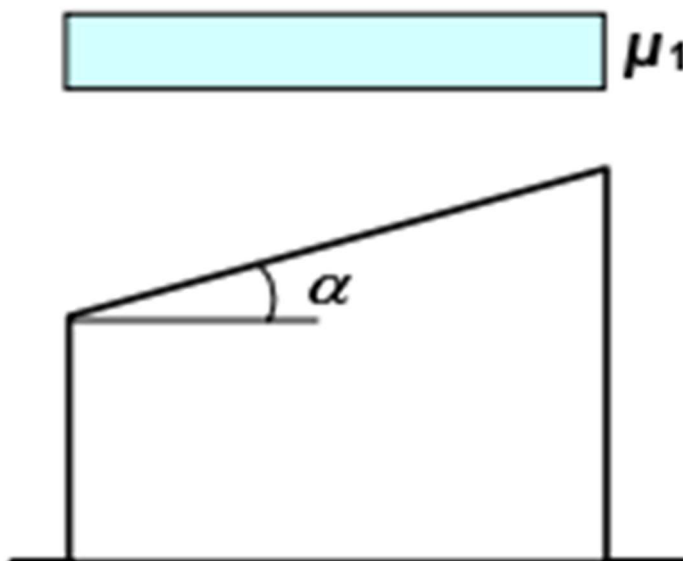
Undrafted and drifted snow load arrangement on monopitch roof
